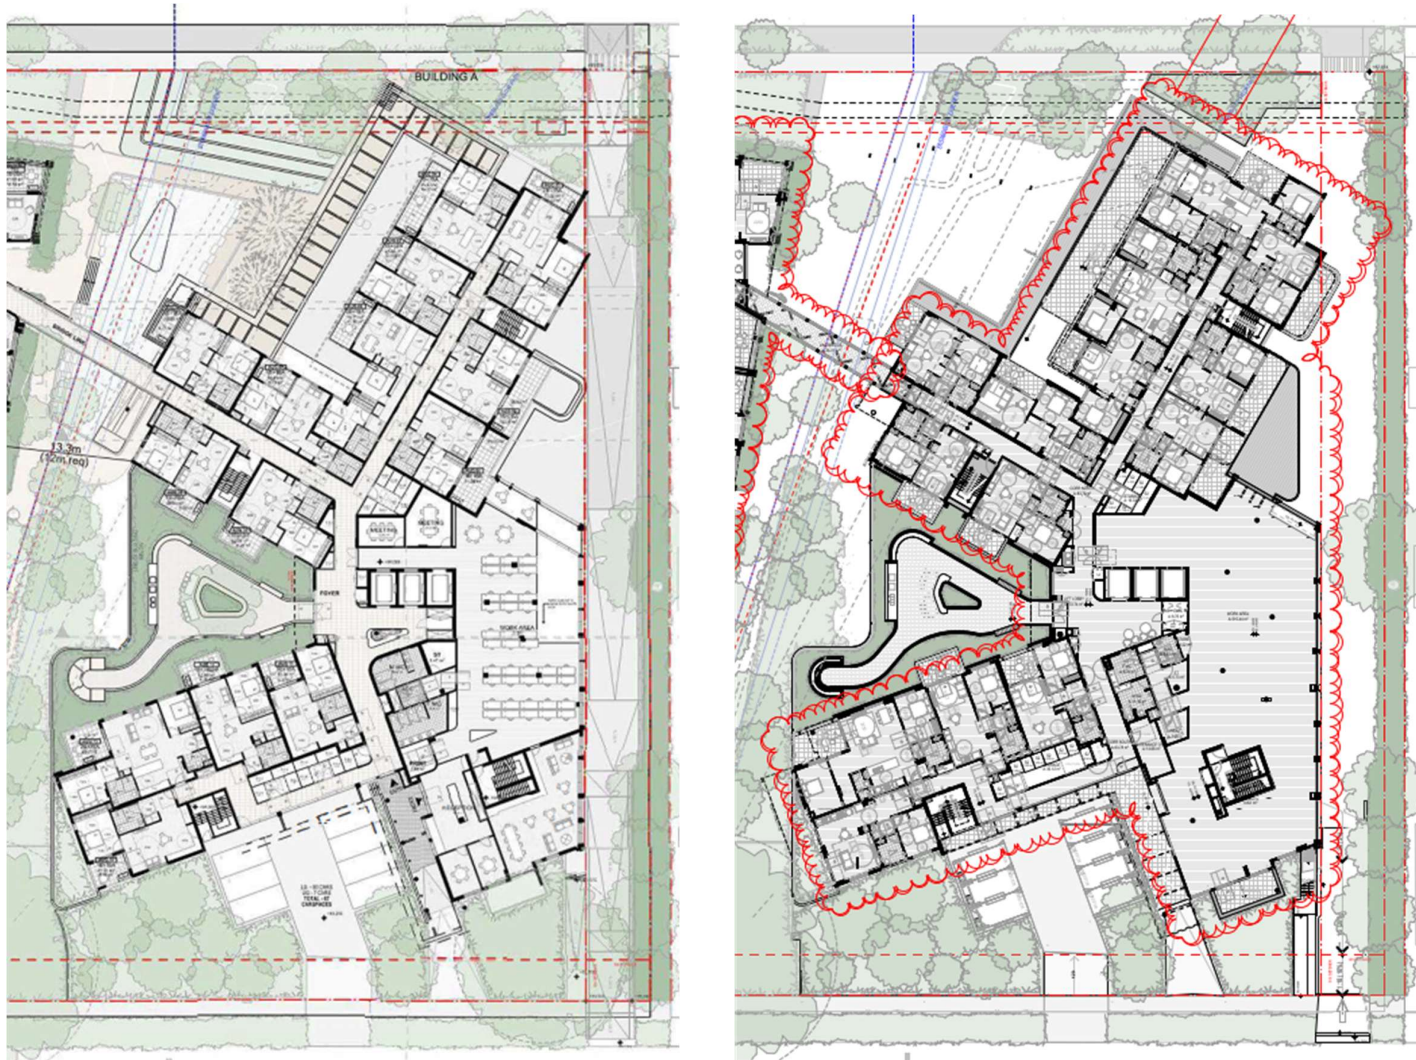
Approved and Proposed Upper Ground Level Stage 01 of Building A (2 of 2)
